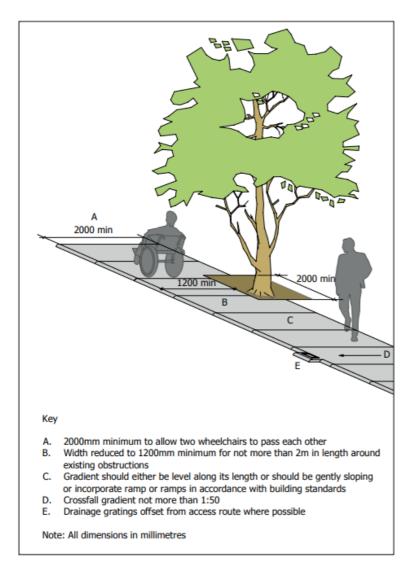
Urban Environment Pavement Layout (Note: Extracted from NDA Building for Everyone: A Universal Design Approach)
